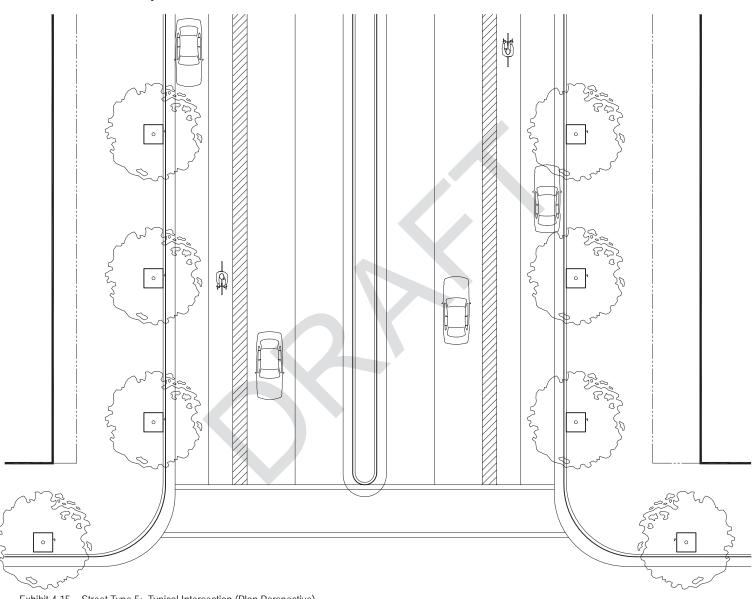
Street Type 5: Typical Intersection (Plan Perspective)
